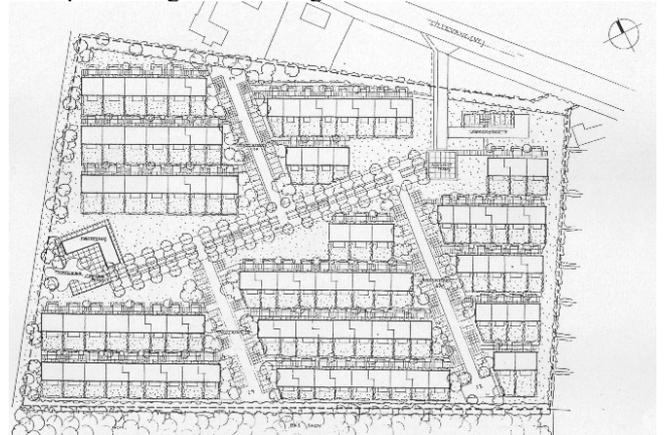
Proposed Site Plan, Farum Sodal, Denmark.
